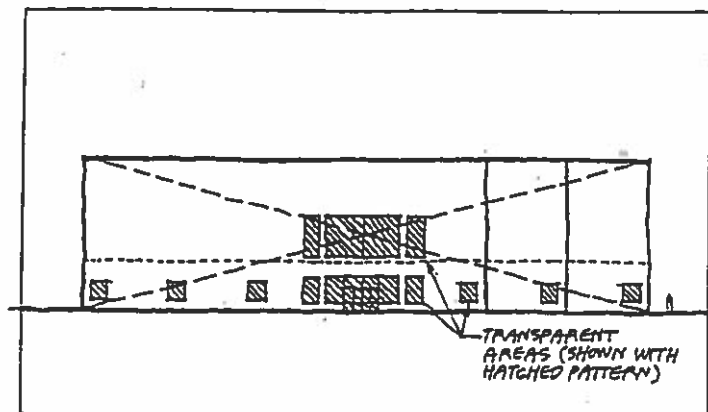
B EXAMPLE SHOWING 50% OF THE SUGGESTED MINIMUM TRANSPARENT AREA ALLOCATED TO THE GROUND FLOOR FAÇADE.
